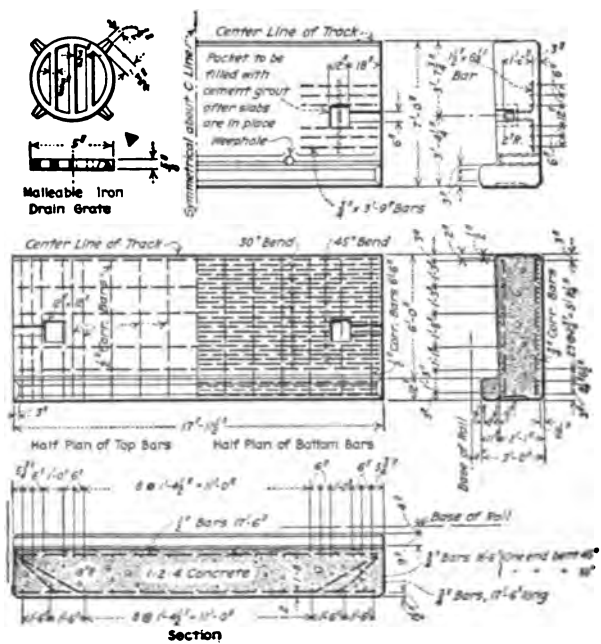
Standard slab for clear spans of 16 ft., Illinois Central R. R.
